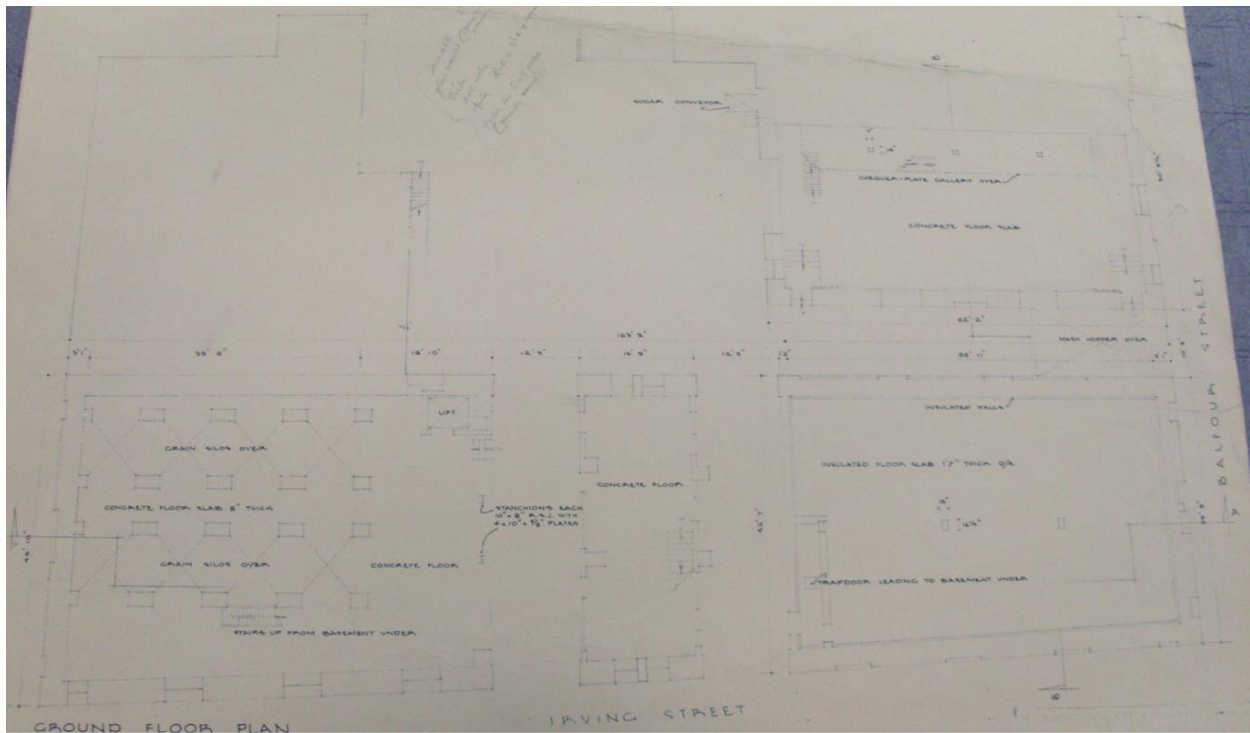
Plan drawings showing windows of Irving Street Brewery buildings: Ground floor plan by Lemont Niblett and Daubney, Drawing No. 4E-852A dated 27-07-54
